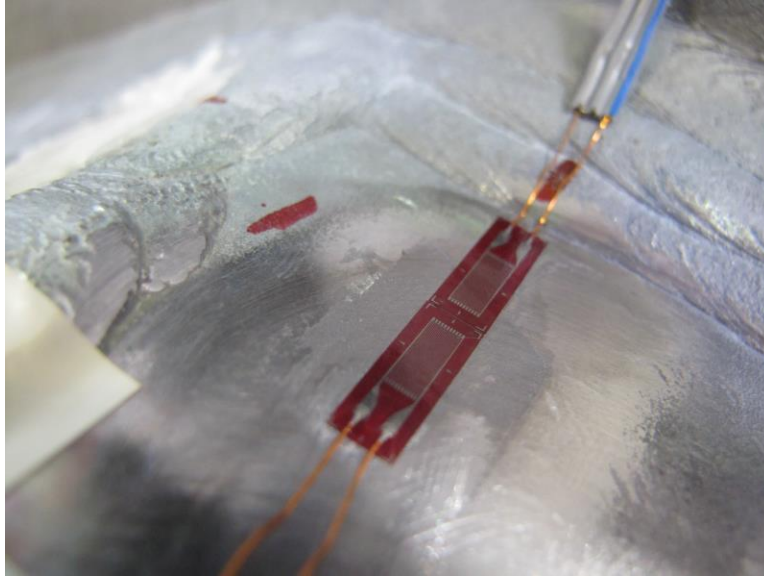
Strain Gauges for Monitoring the Stress Profile Near the Base Plate-to-Shaft Welds
